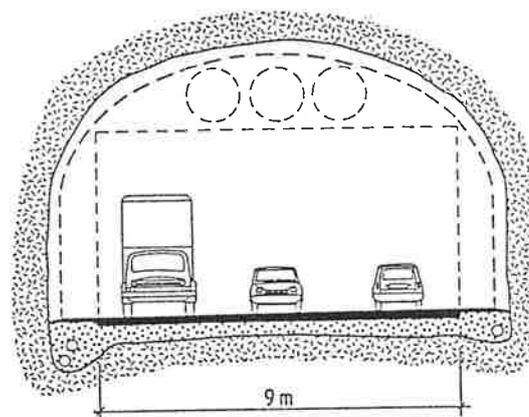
The cross section is 70 m² for a three lane road tunnel
